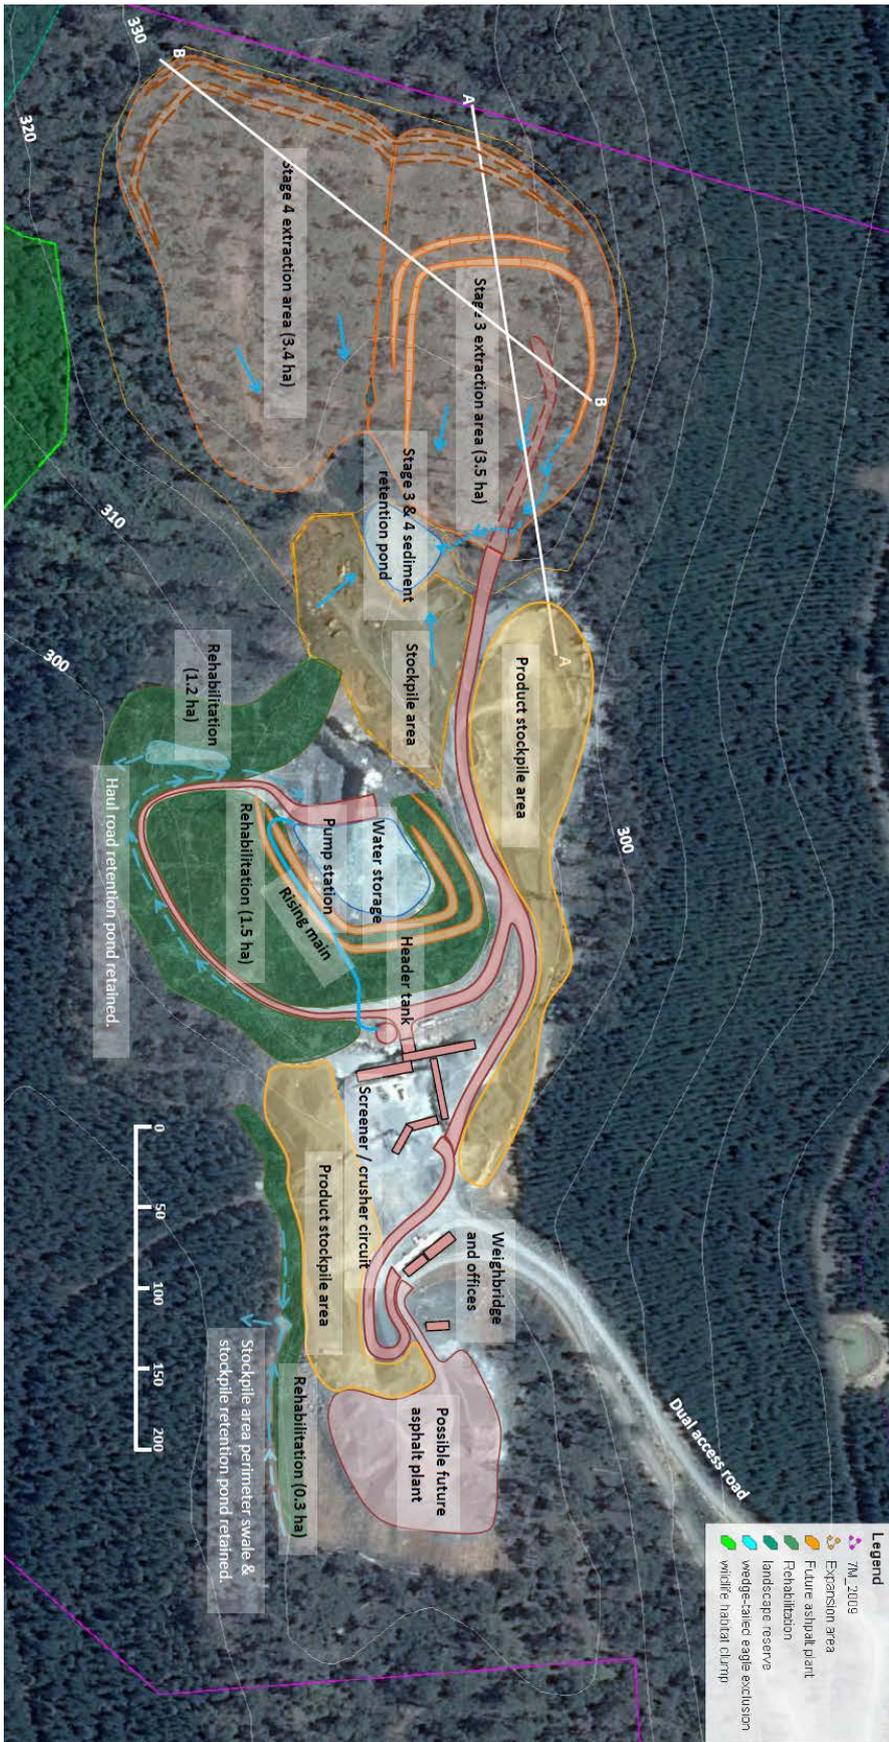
Existing and proposed site layout (From Figure 5 of the DPEMP)
